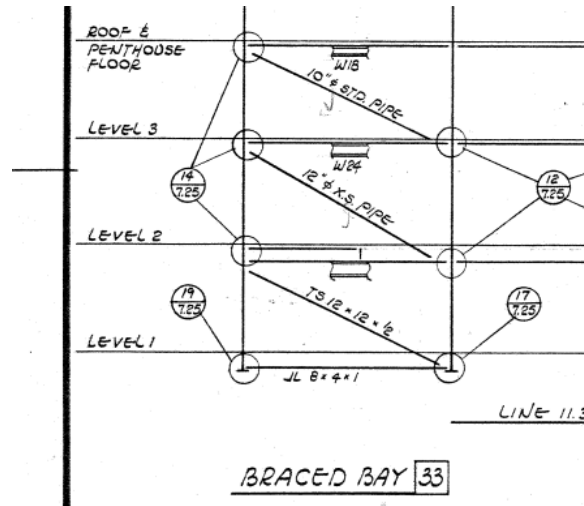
Frame Elevation (82TN4A--113-ZZ1A-2)
